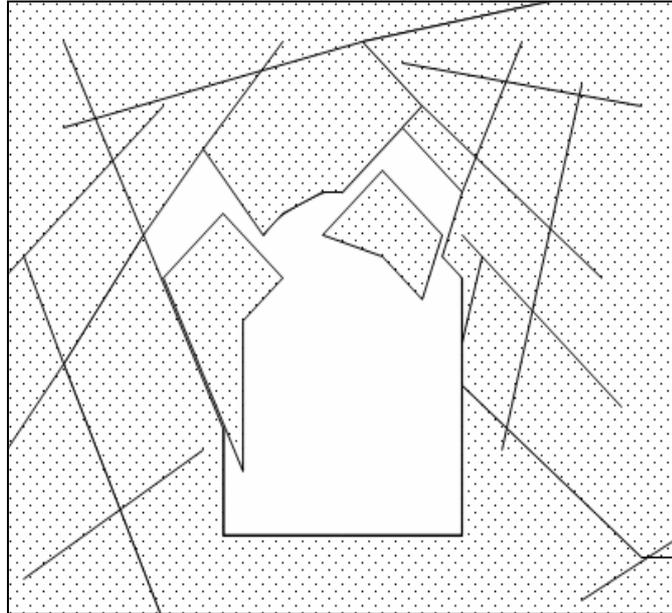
Structurally-controlled failure of polyhedral rock blocks
